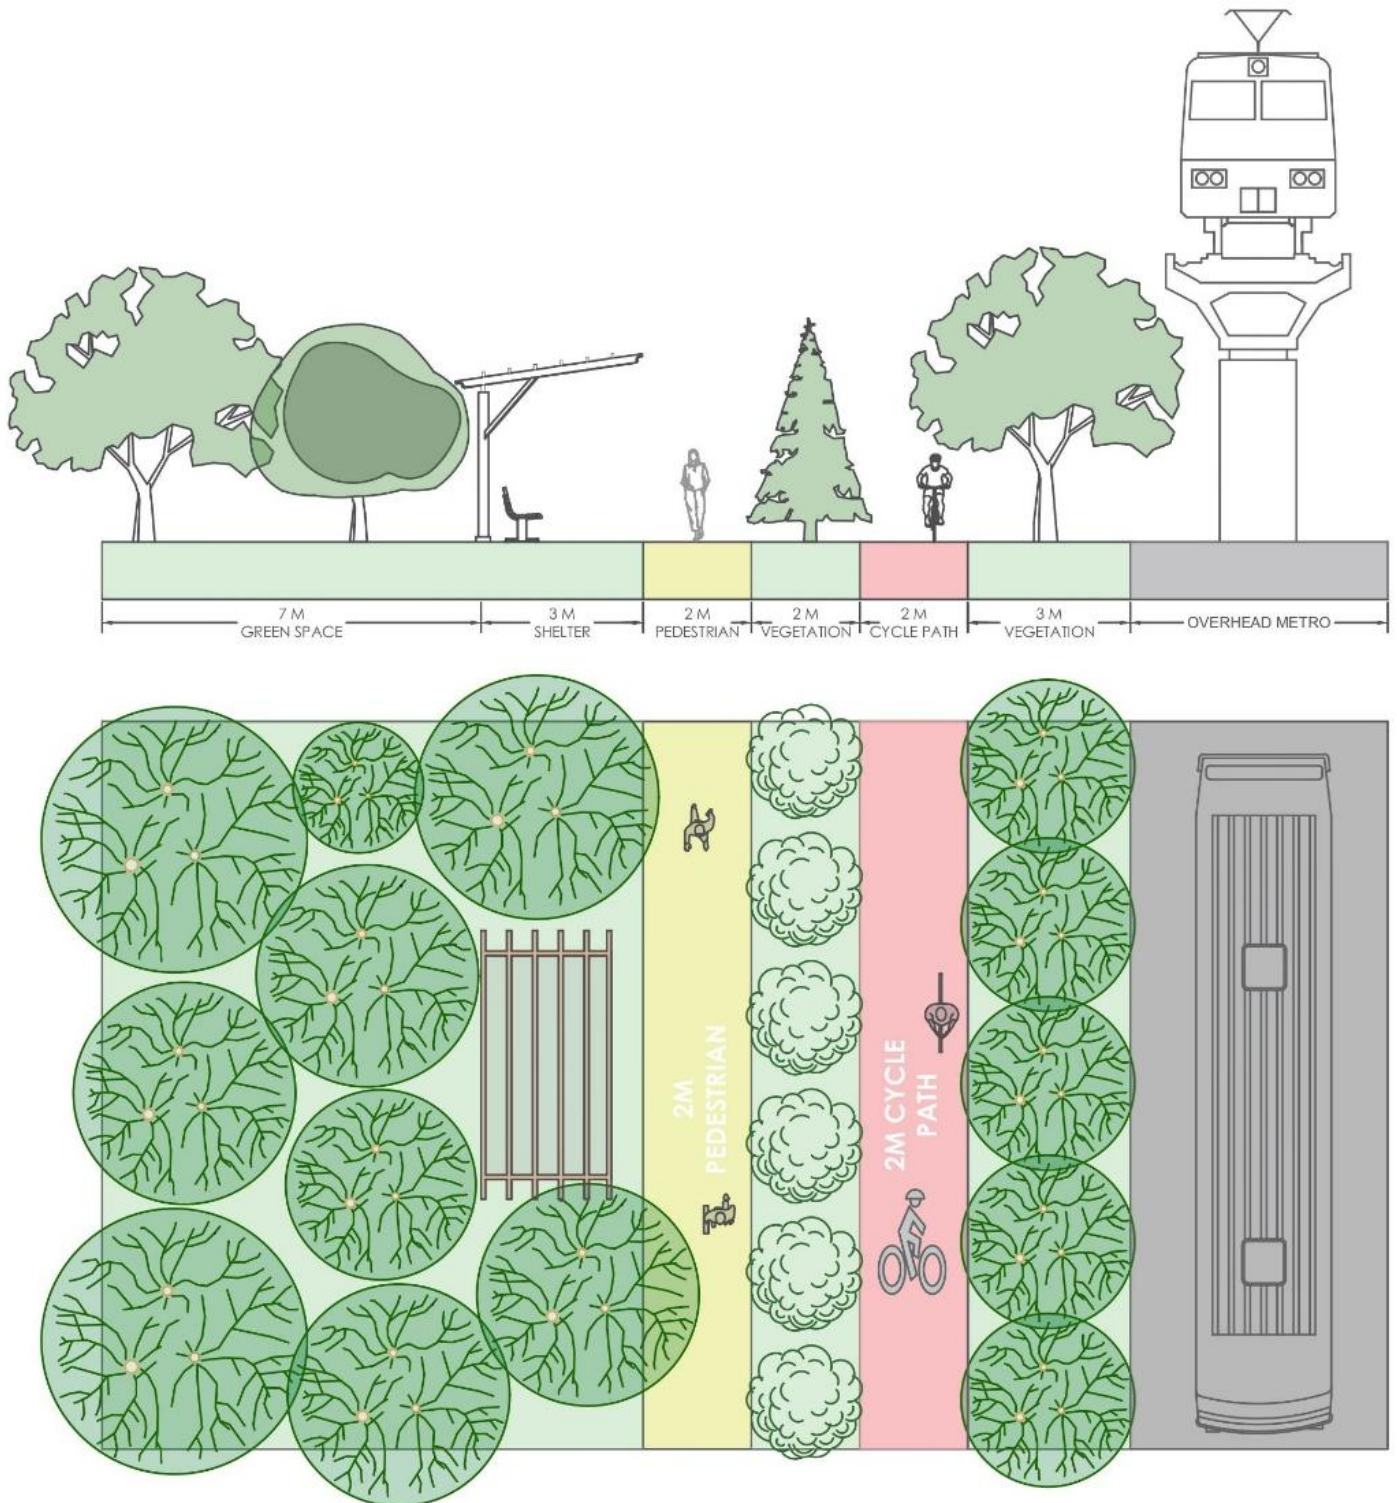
Green Arteries Design plan and elevation 20 meter wide (Author's elaboration)
